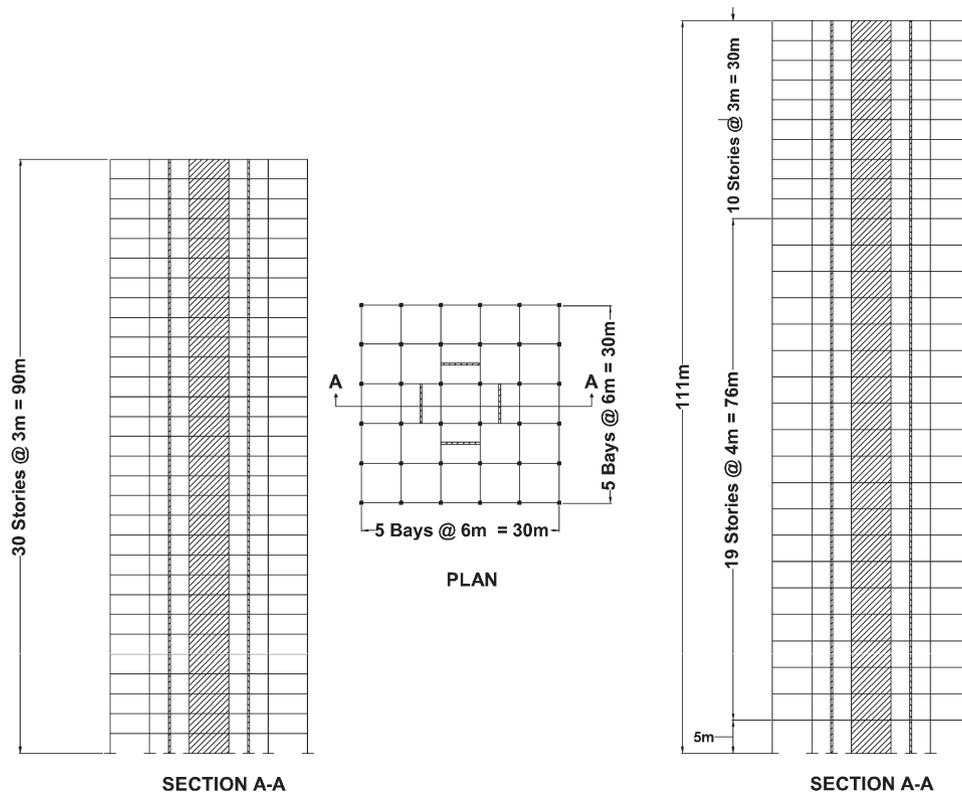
Thirty-storey building plan and elevation for uniform and non-uniform height.
